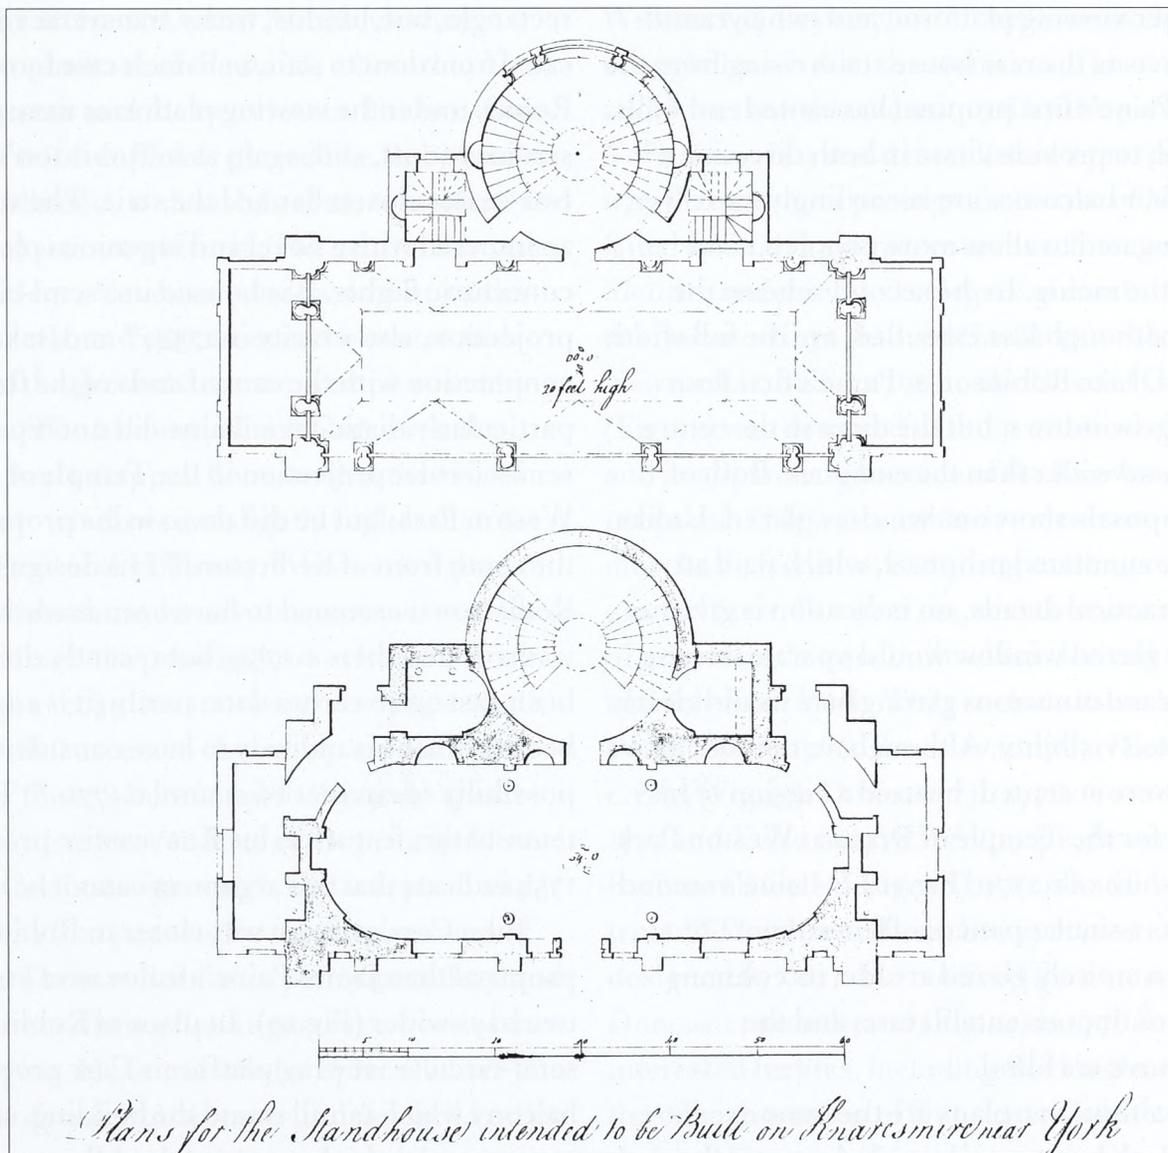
James Paine, Proposed ground and first floor plans for the Knavesmire stand, 1754 (second scheme). *Sheffield Archives.
